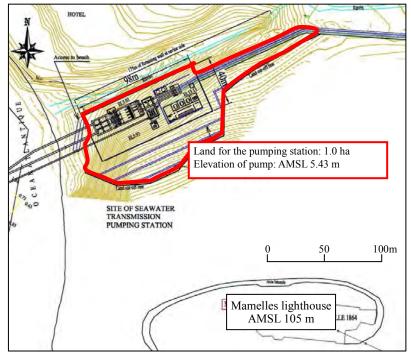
Layout Plan of Seawater Transmission Pumping Station
